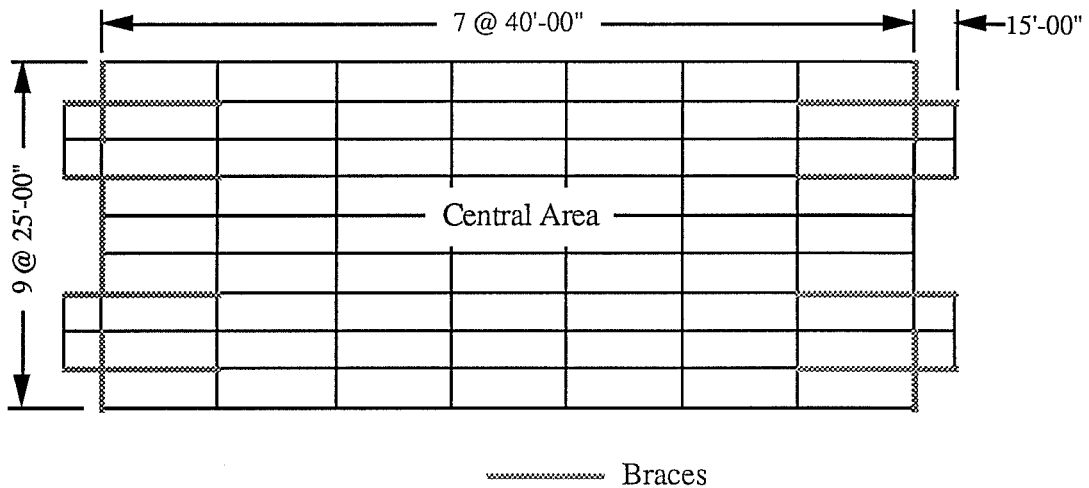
Floor Plan of Typical High-Tech Industrial Facility
